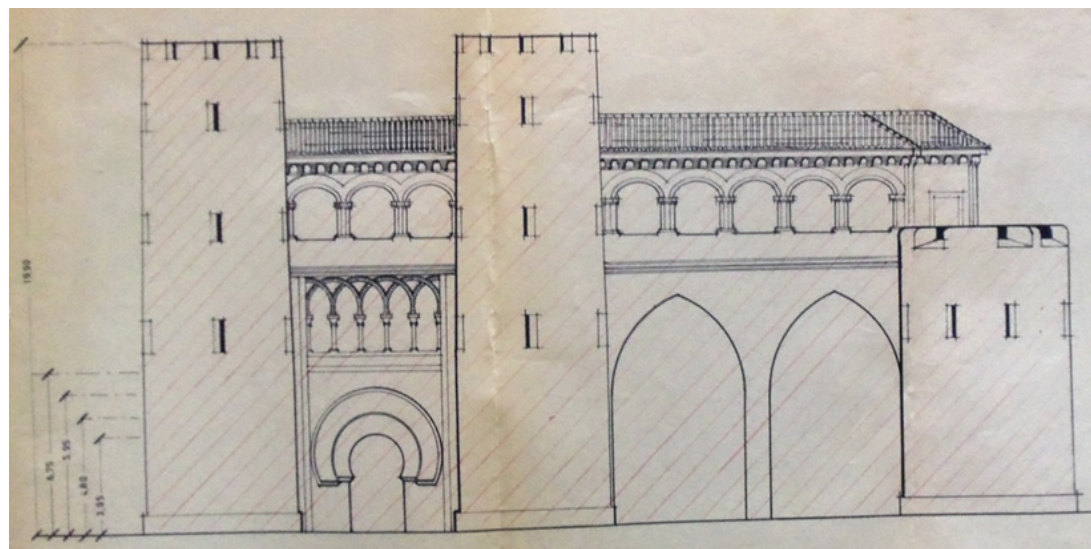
Elevation of this projected state. The towers to be rebuilt are shown in a grid. Source: Iñiguez Almech, (1970).
